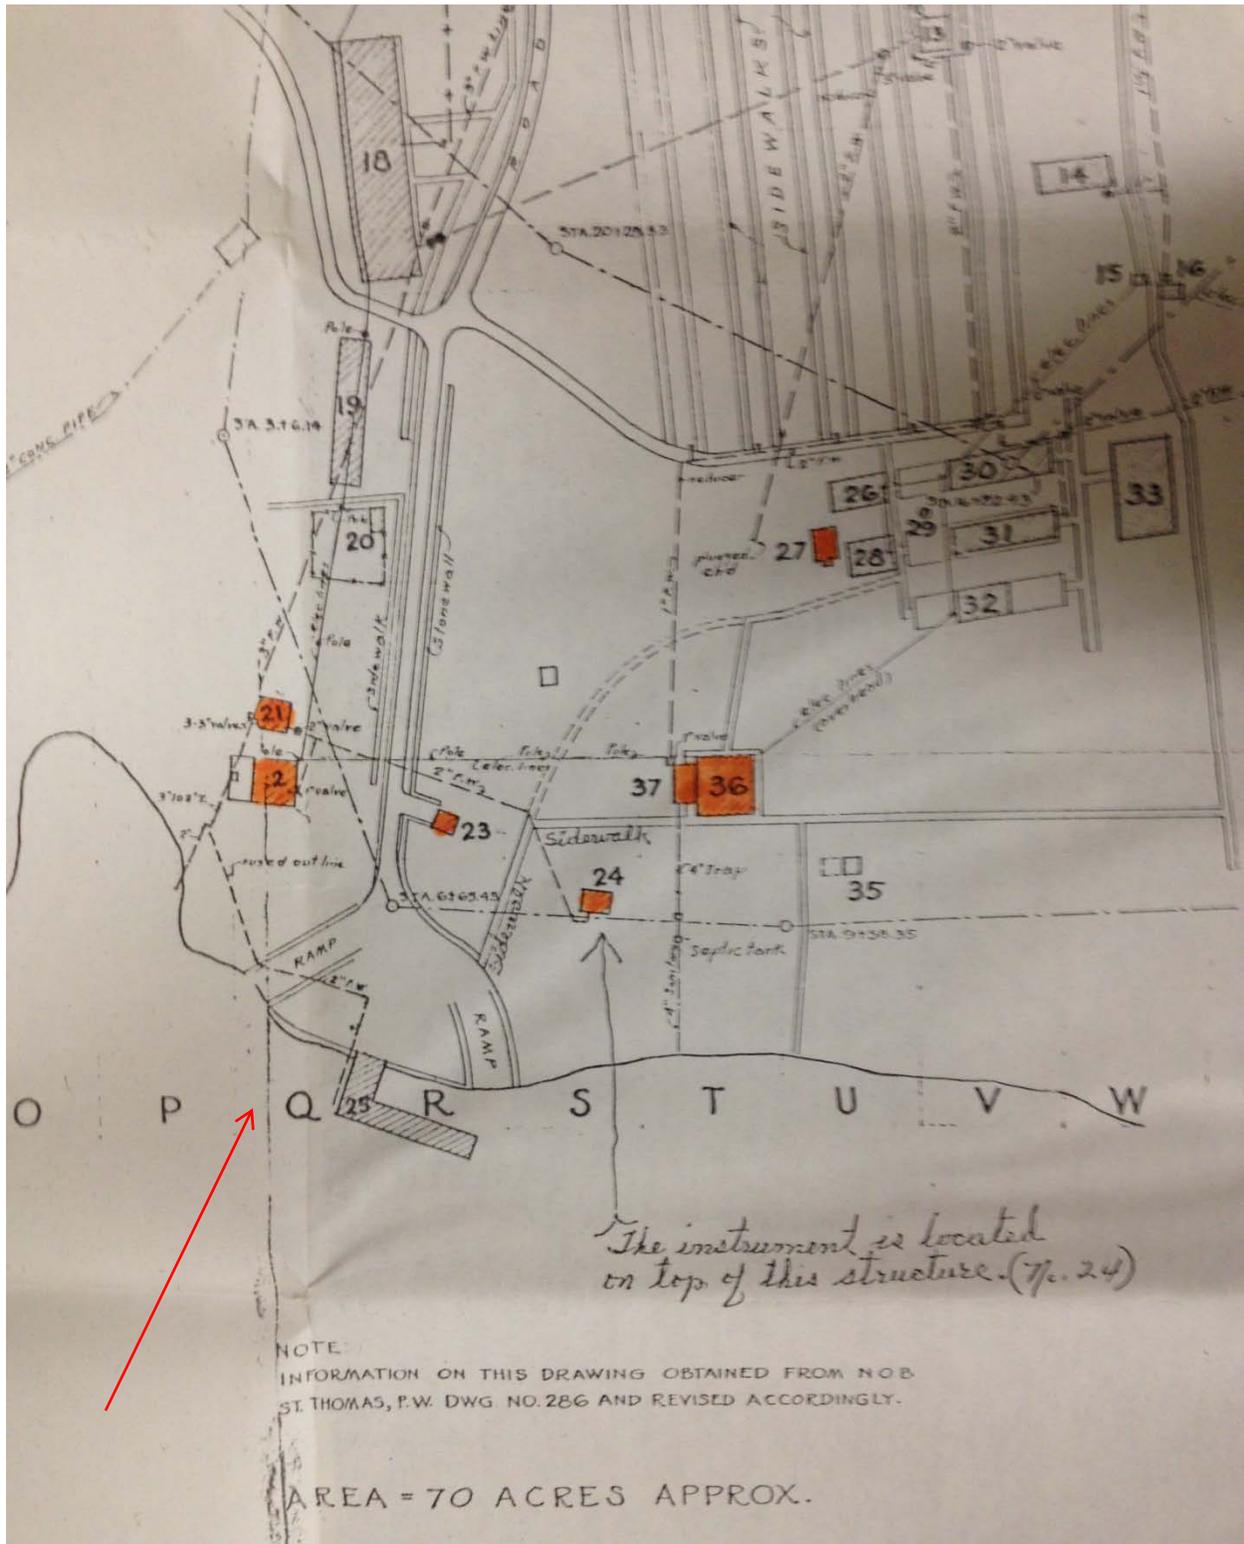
Map of the south section Camp Roosevelt in 1944. The dock is similar in dimensions and configuration to the existing one.
